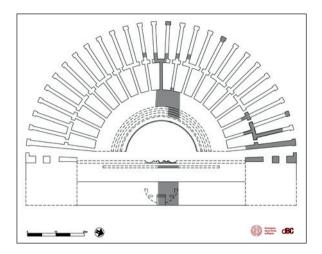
Theatre, preliminary reconstructive plan with indication of the excavated sectors in dark grey (Ghiotto *et al.* 2021).
